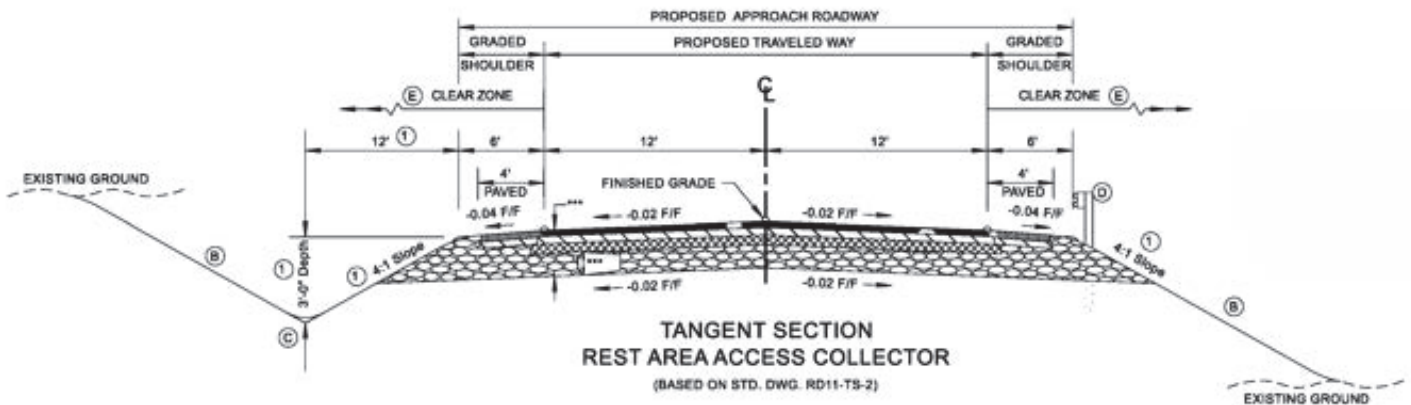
Typical Tangent Section Rest Area (Welcome Center) Access Collector
